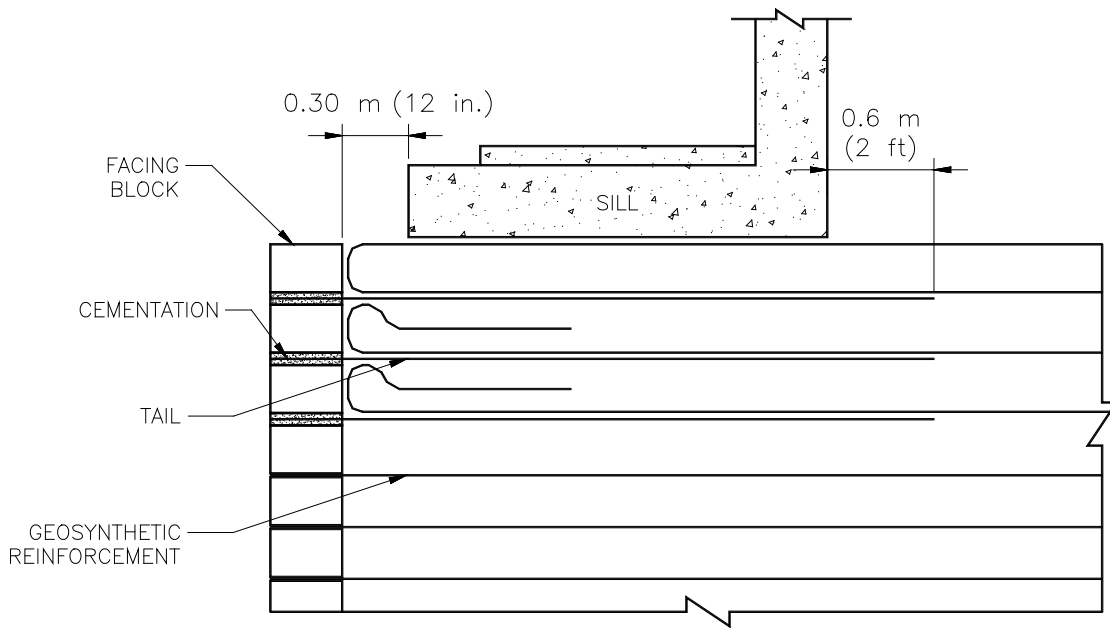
Details of reinforcement layout near the top of the load-bearing wall
